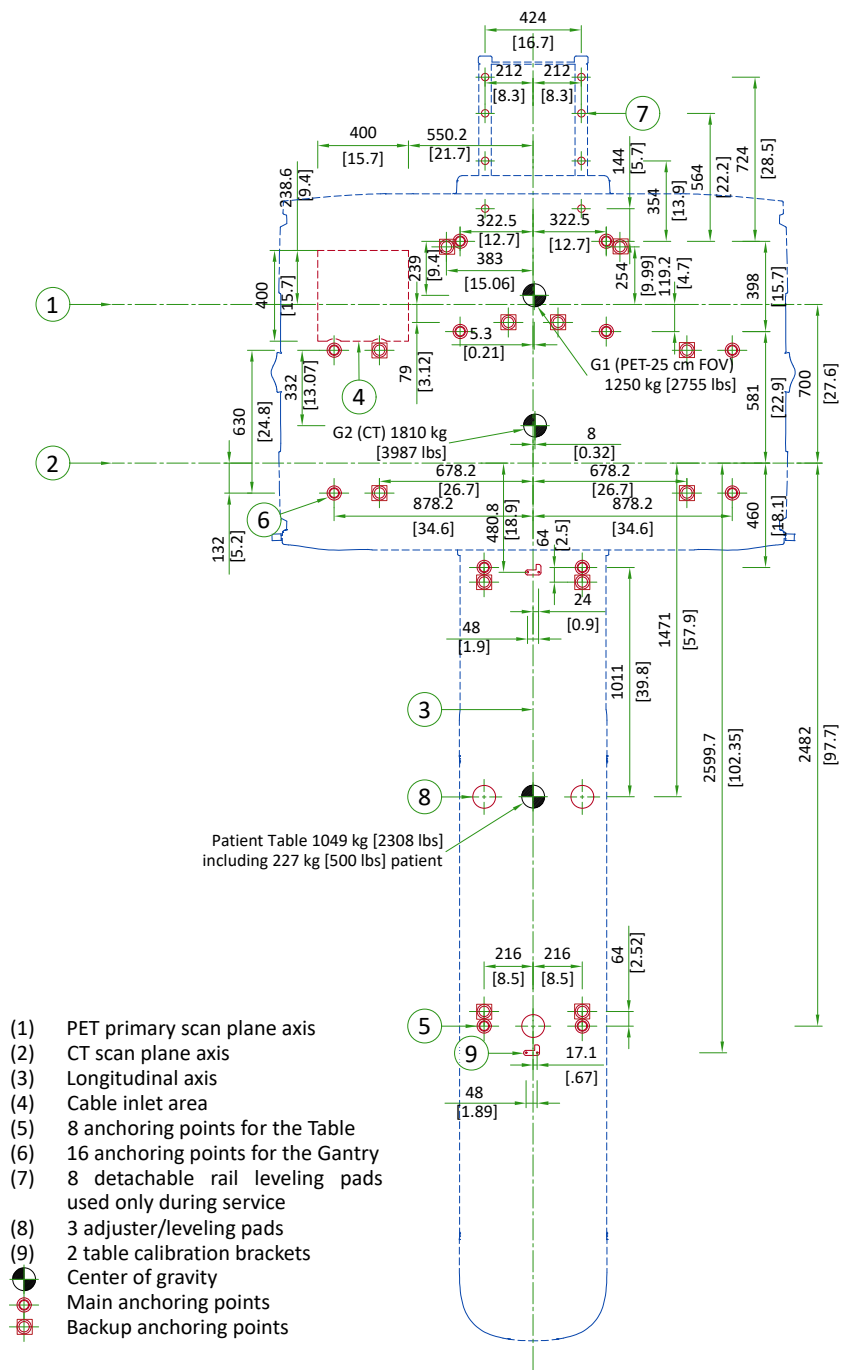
Floor Mounting Detail (Weldment Gantry)
